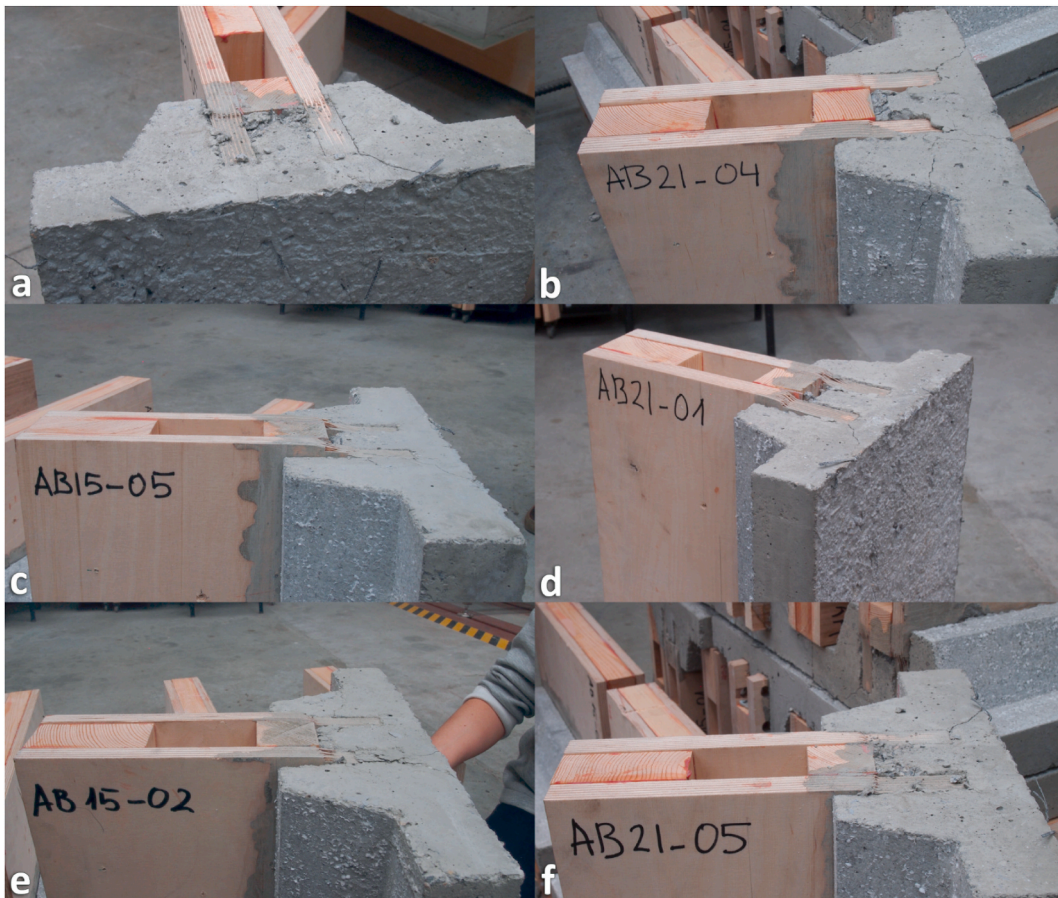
a and b-Cracks in the concrete. c and d-Test T1, 15 and 21 mm boards. e and f-Test T2, 15 and 21 mm boards.
